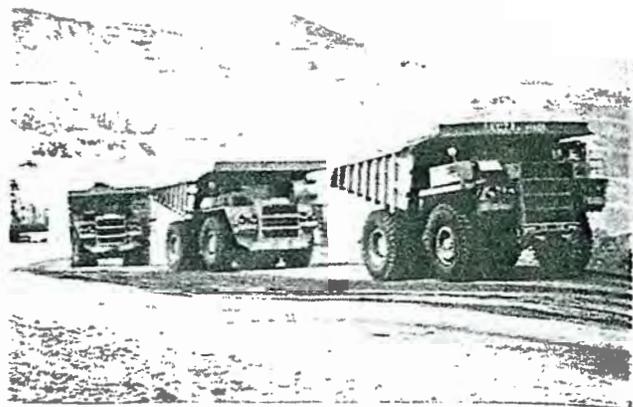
Haulroad design and construction was addressed by the USBM in the 1970s
